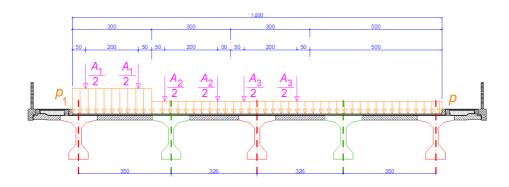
Traffic loading on the enlarged bridge with solution DA (annotations in cm)
